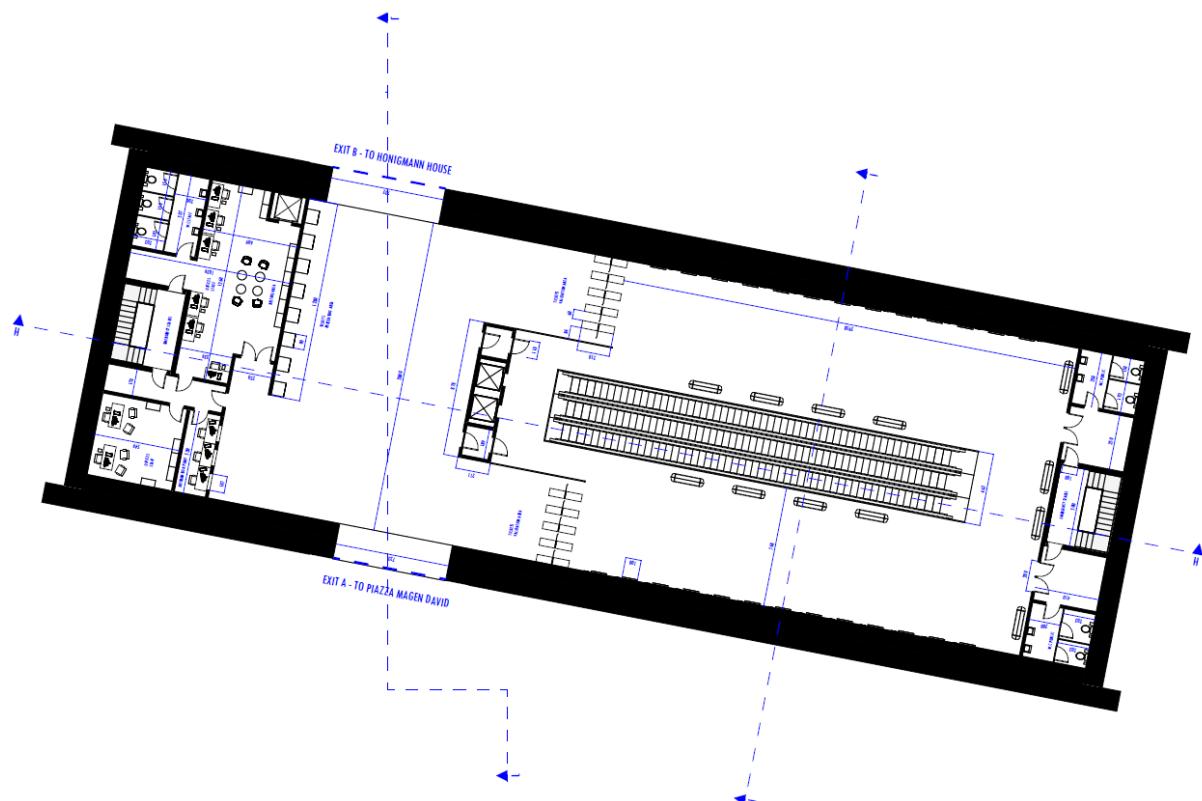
Magen David metro station ticketing level floor plan (for scaled version and the plans of the exit corridors see fig.B.17 in appendix). Source: drawing by the author.
